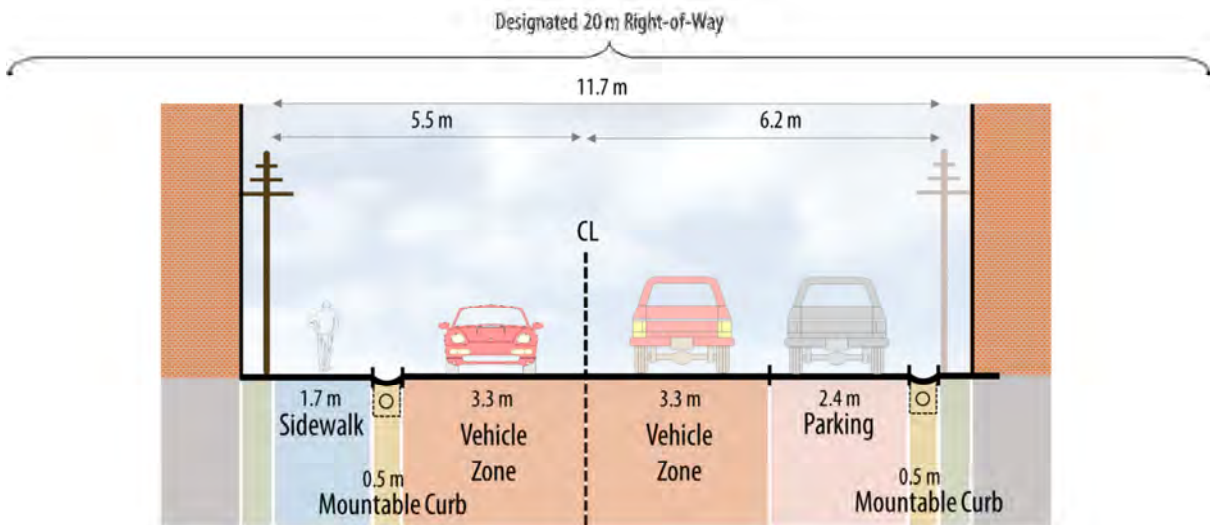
11.7 m Platform Semi-Rural Cross-Section with Sidewalk and Parking for Belfountain Village (Bush St. to Community Centre)
